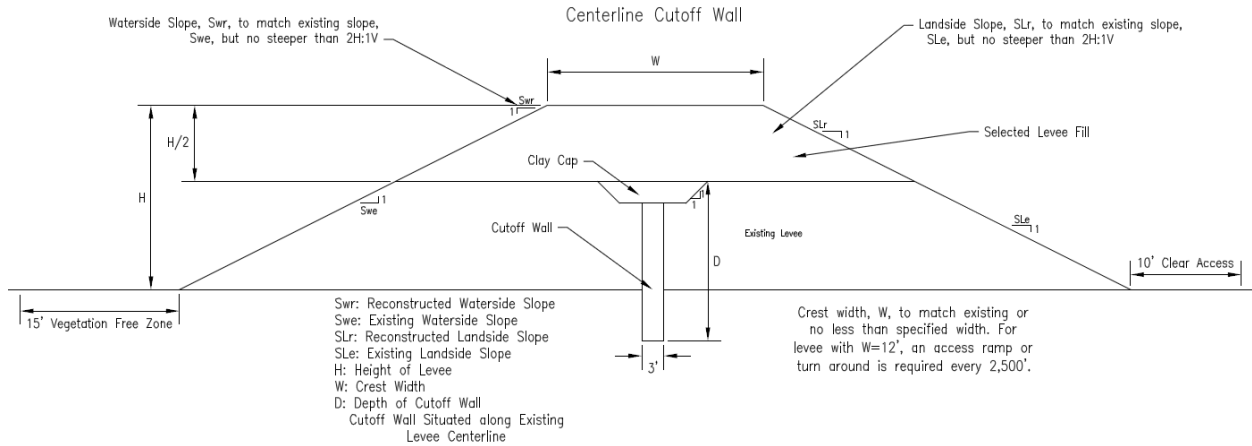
Template Option 2 – Centerline Cutoff Wall
